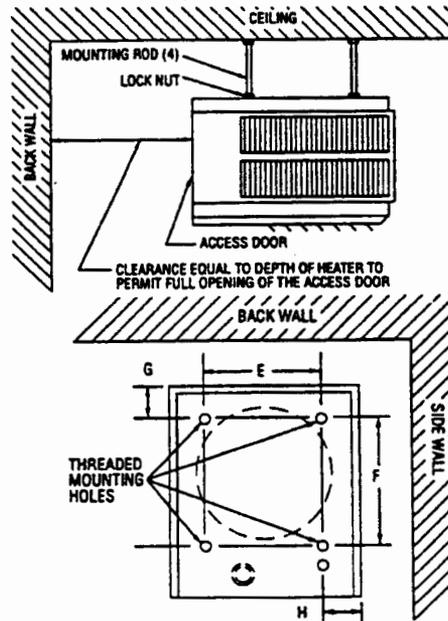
Vertical Discharge Mounting and Rod Spacing
